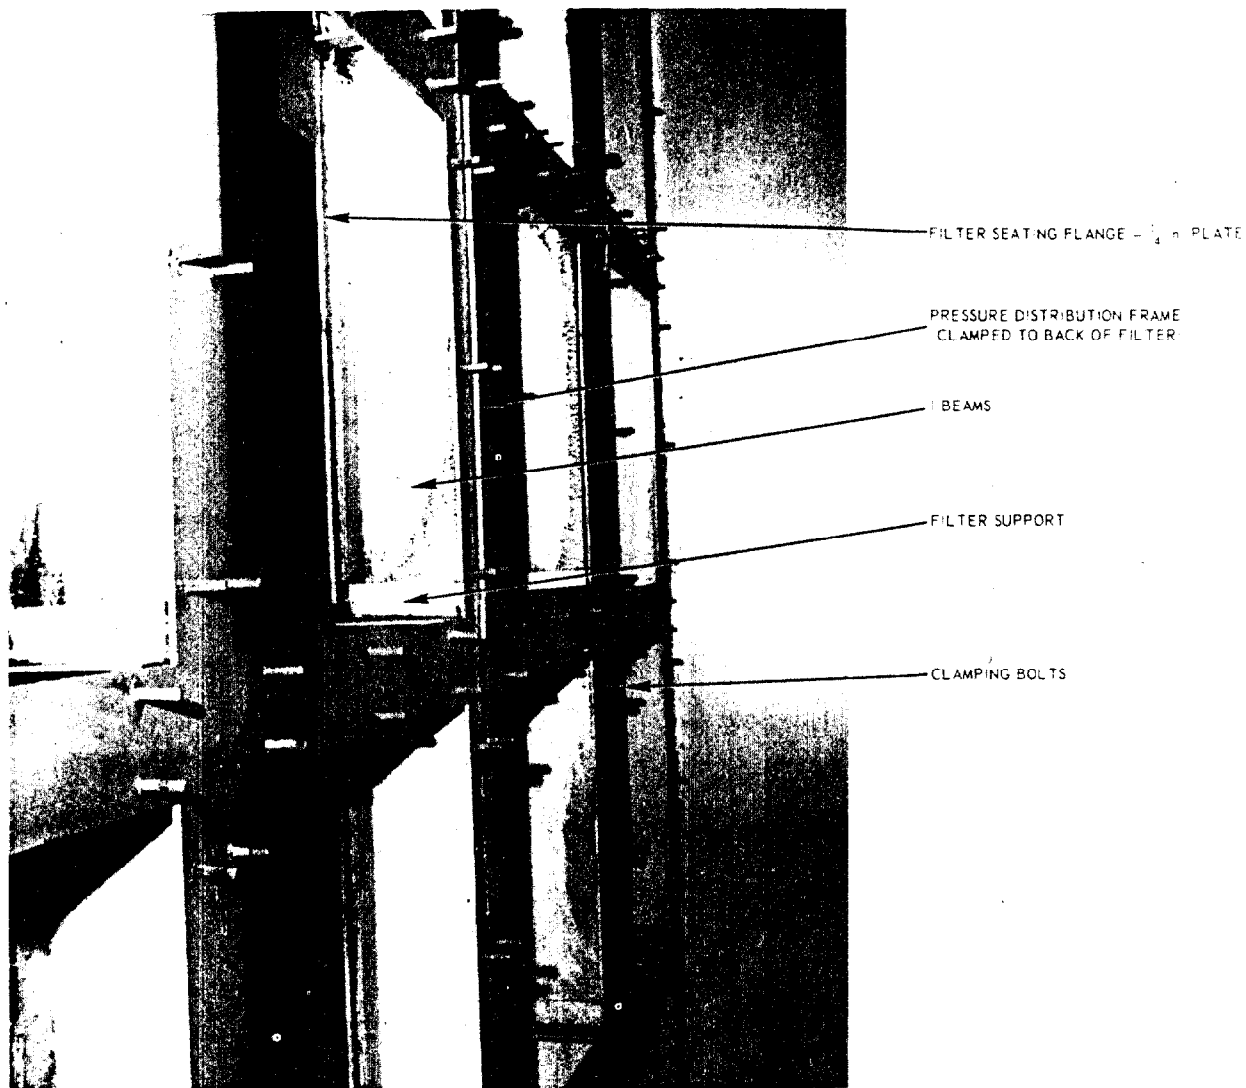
Built-up pocket-type filter mounting frame for 500-cfm HEPA filters.
